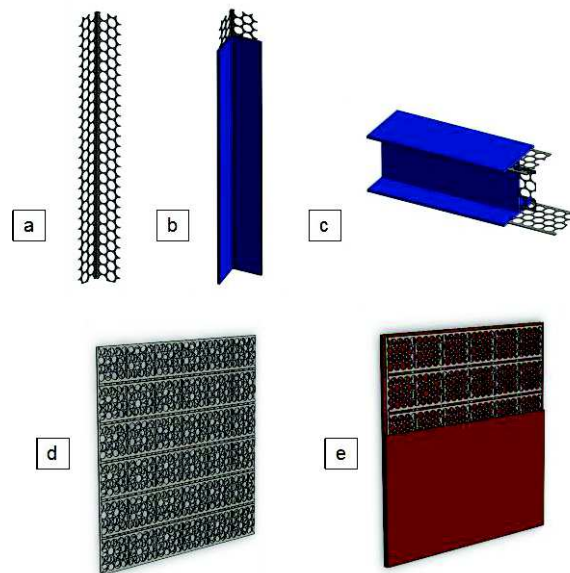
Perforated steel L and I shape profiles (a, b, c) and structures (d, e).
